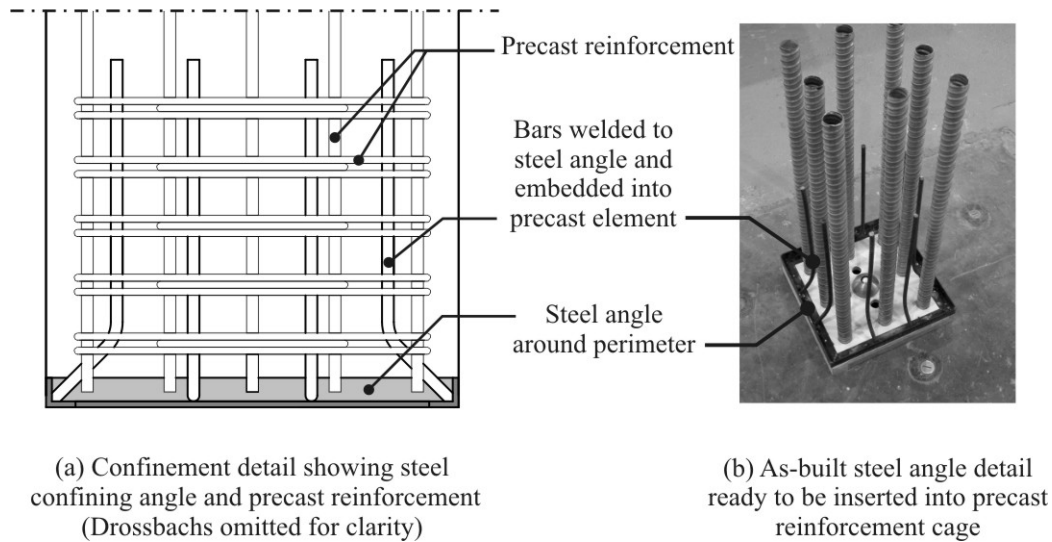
Post-tensioned pier HBD1 structural details
